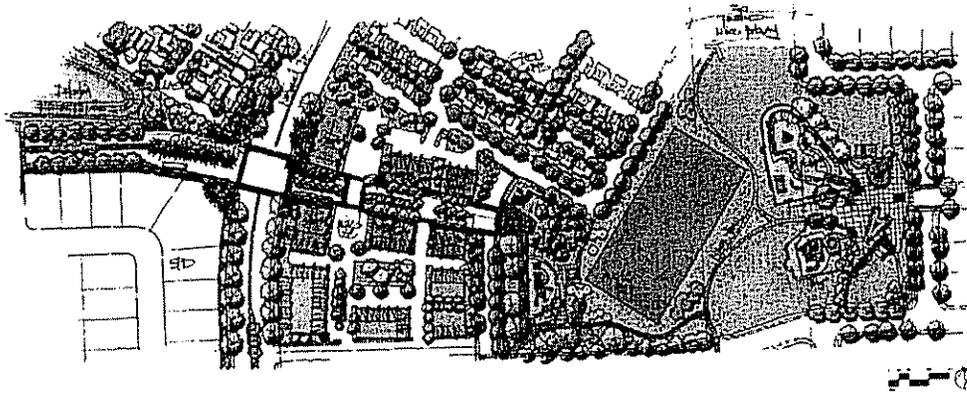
Schematic Mixed-Use Development Plan (Planning Area 15).
